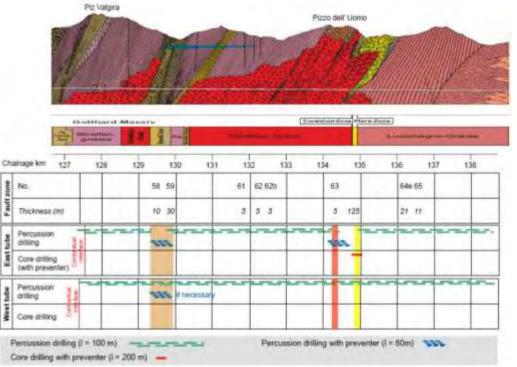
Gotthard Base Tunnel, Section Faido, concept for probe drillings
